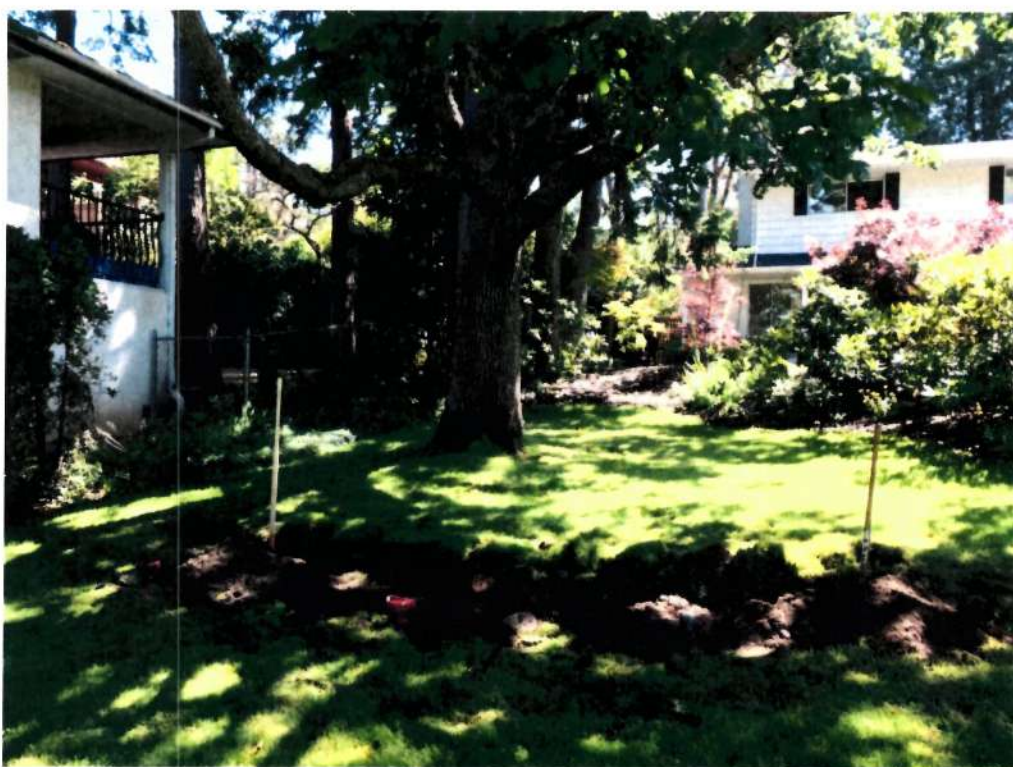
We conducted an exploratory excavation at the northwest side of the proposed building to be constructed at 931 Redfern Street. Excavation occurred as close as 3.6m from the centre of the trunk of Garry Oak #200.
